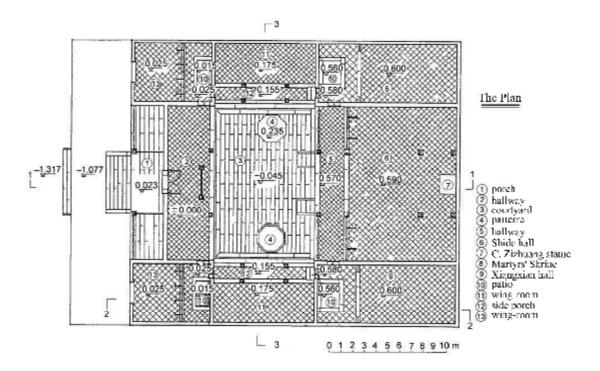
The general plan of Guangzhou Chen Daifu Ancestral Temple.
